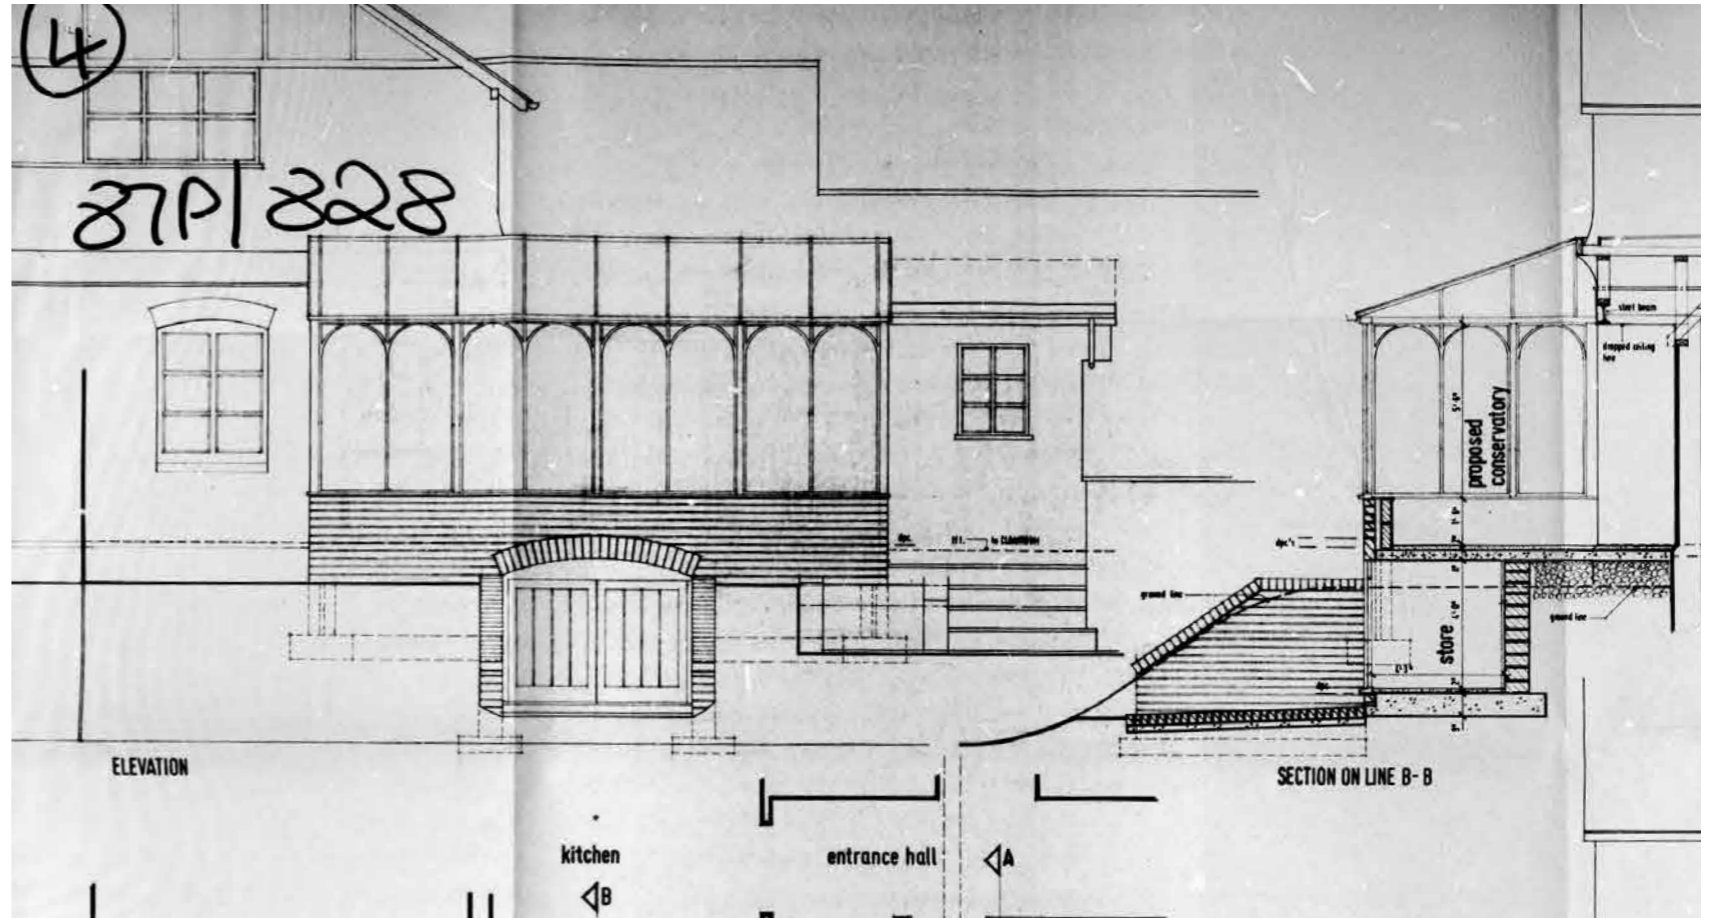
Previous approval REF: 87/P/0828- Proposed Rear Conservatory Elevation and Section through Basement Store (NTS)
